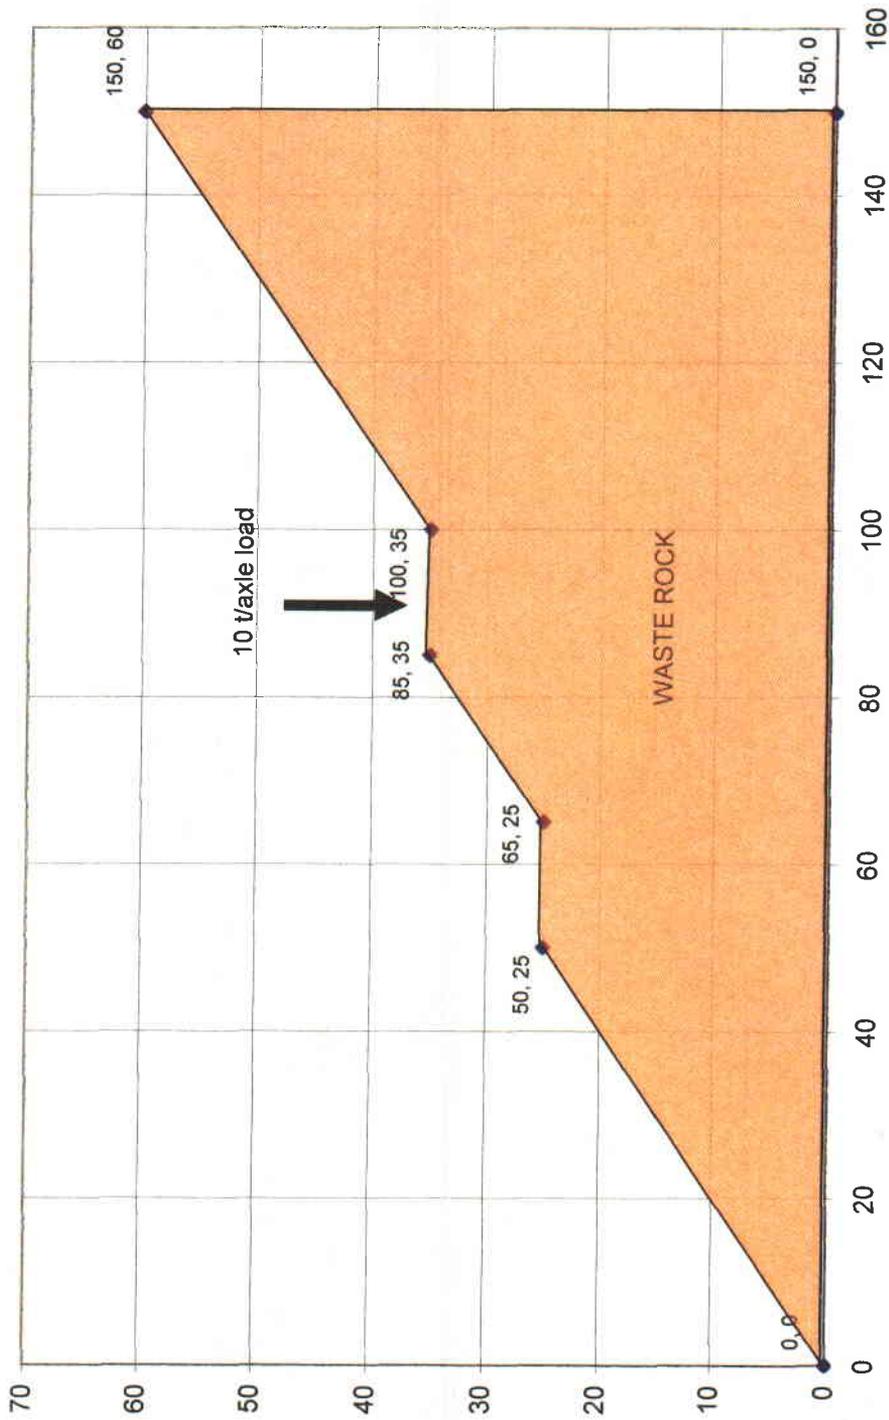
ROADCUT SWITCHBACK PROFILE
